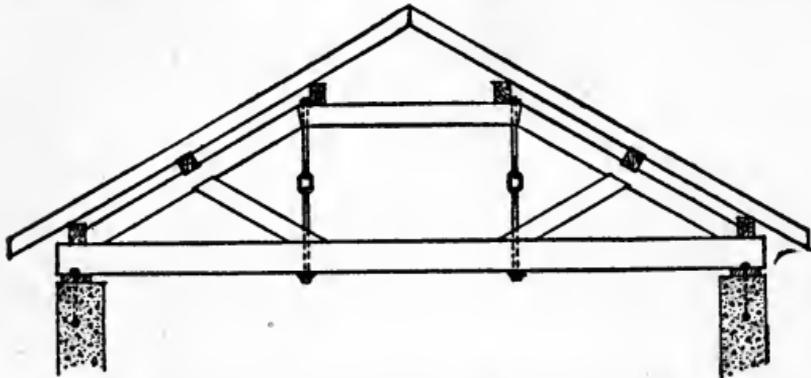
Another Style of Roof Truss Built Strong Enough to Support the Roof of a Farm Garage Without Center Posts
